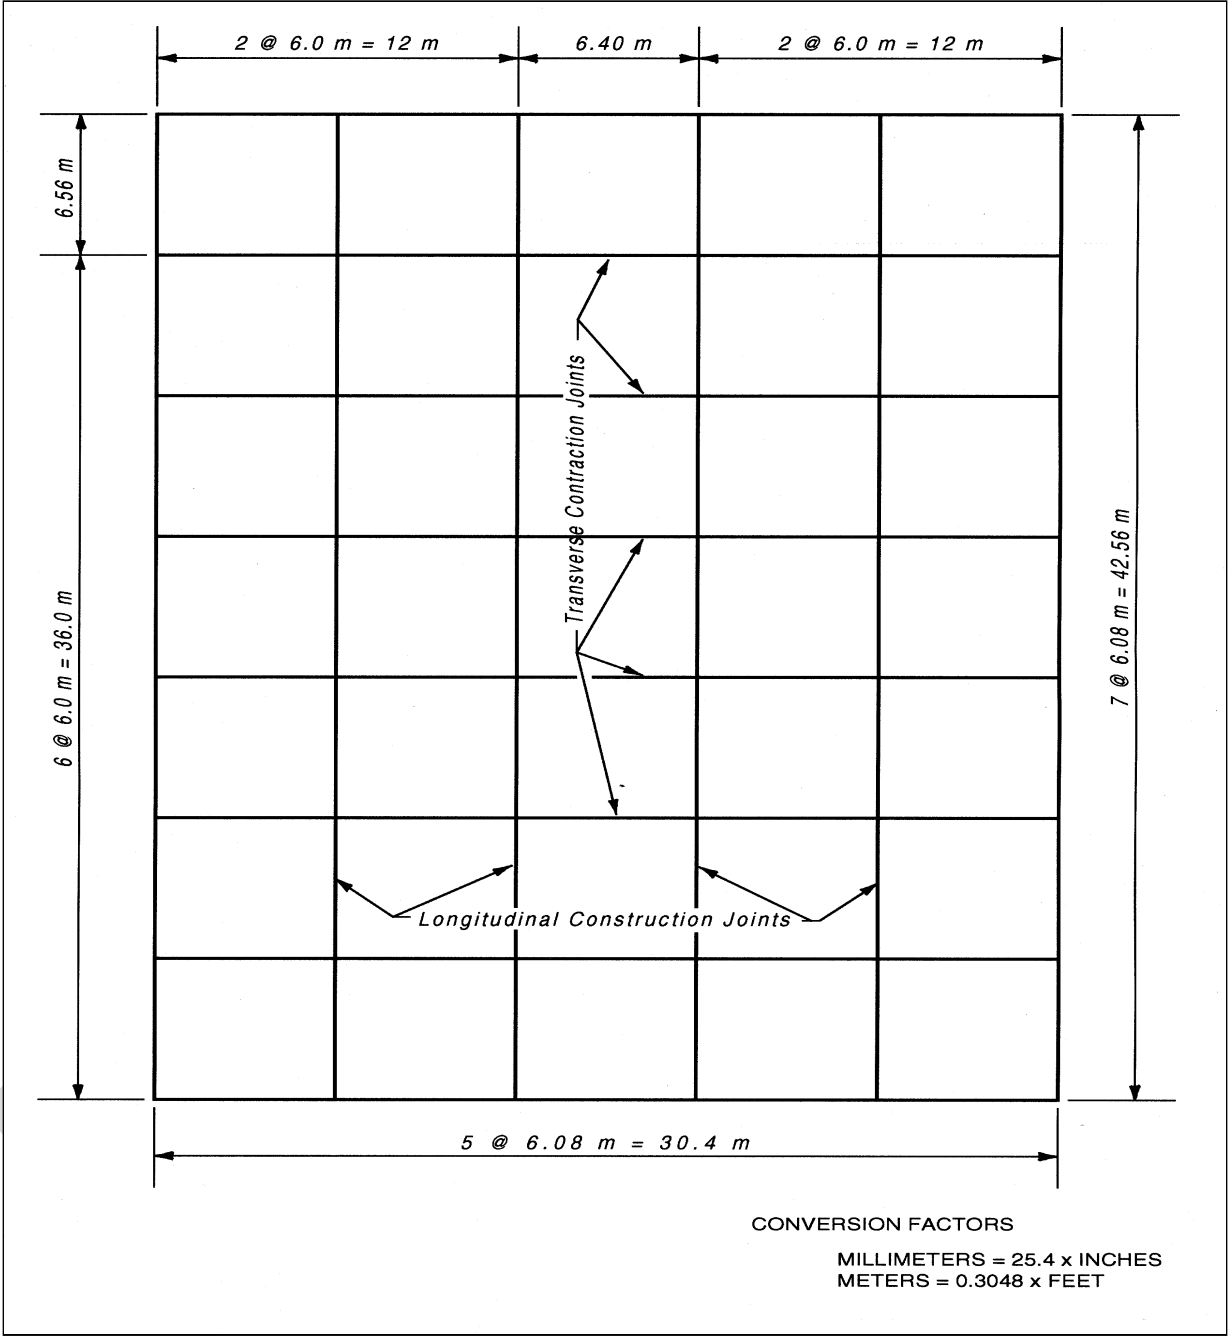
Sample Jointing Pattern for 180-ft-wide Pavement
